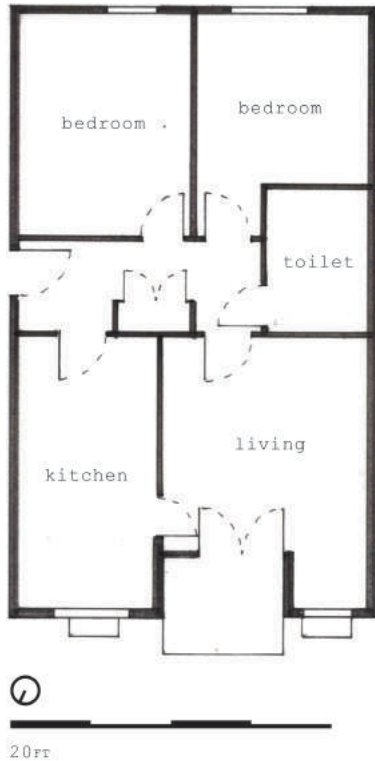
ASTOC Architects and Planners, unit plan, Cologne, Germany, 2012.
